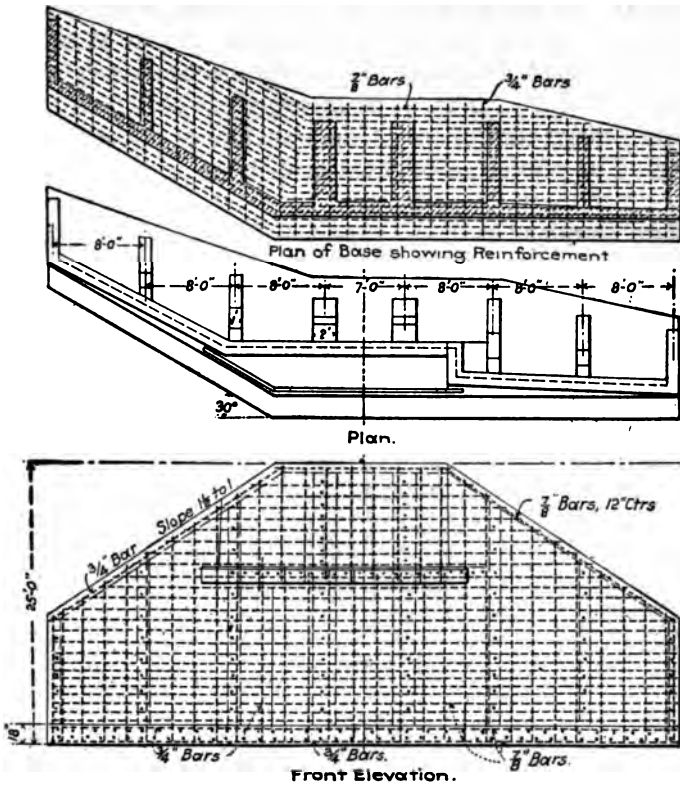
Plan and Elevations 25-Ft. Abutment, K. C., M. & O. Ry.
